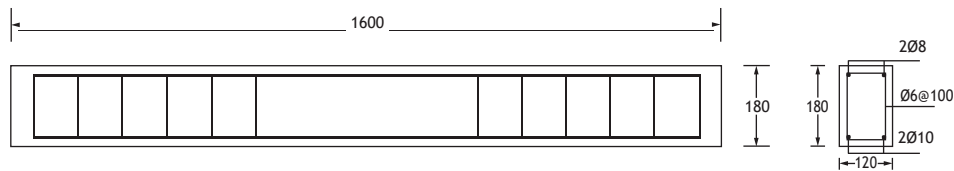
Size and reinforcement diagram of the test beam (unit: mm).
